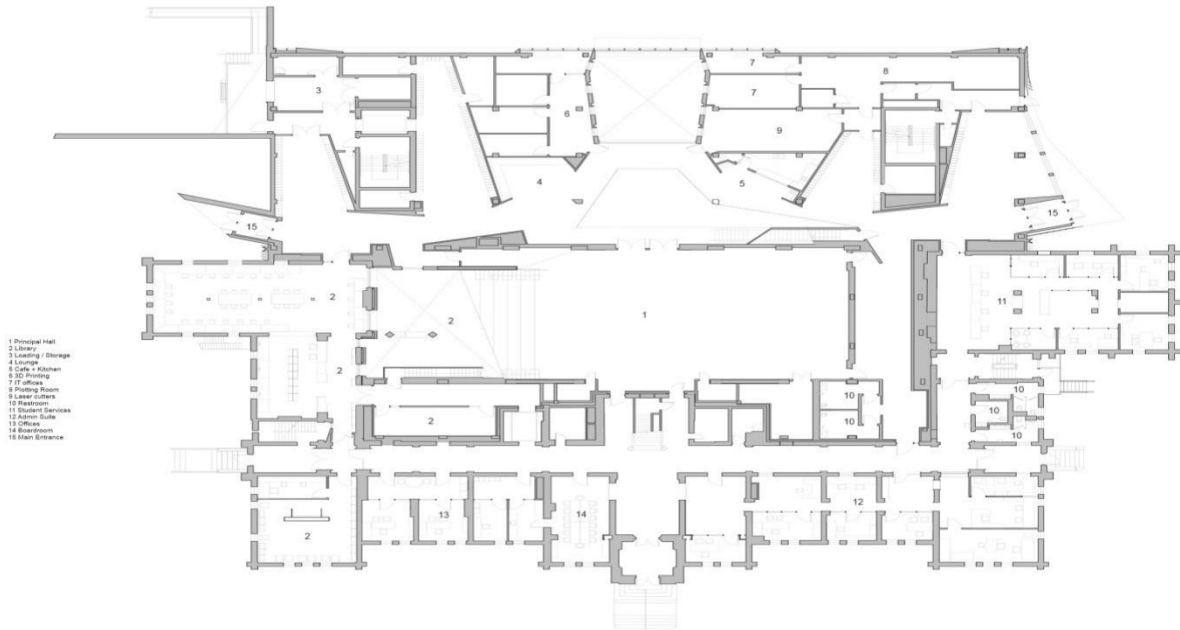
; Floor plan faculty of architecture u.o.t. Canada
